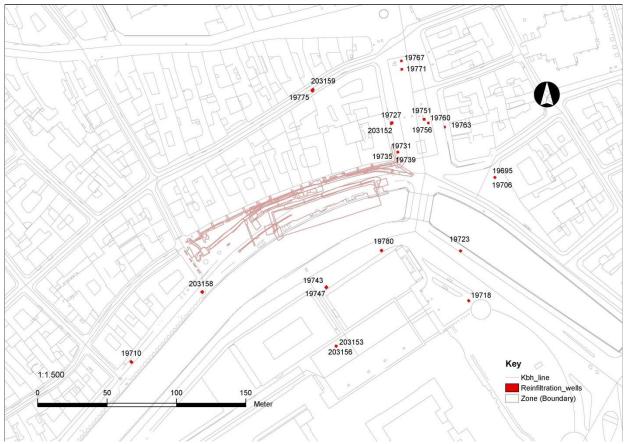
Plan showing location of Re-infiltration wells/trenches surrounding the project area.
